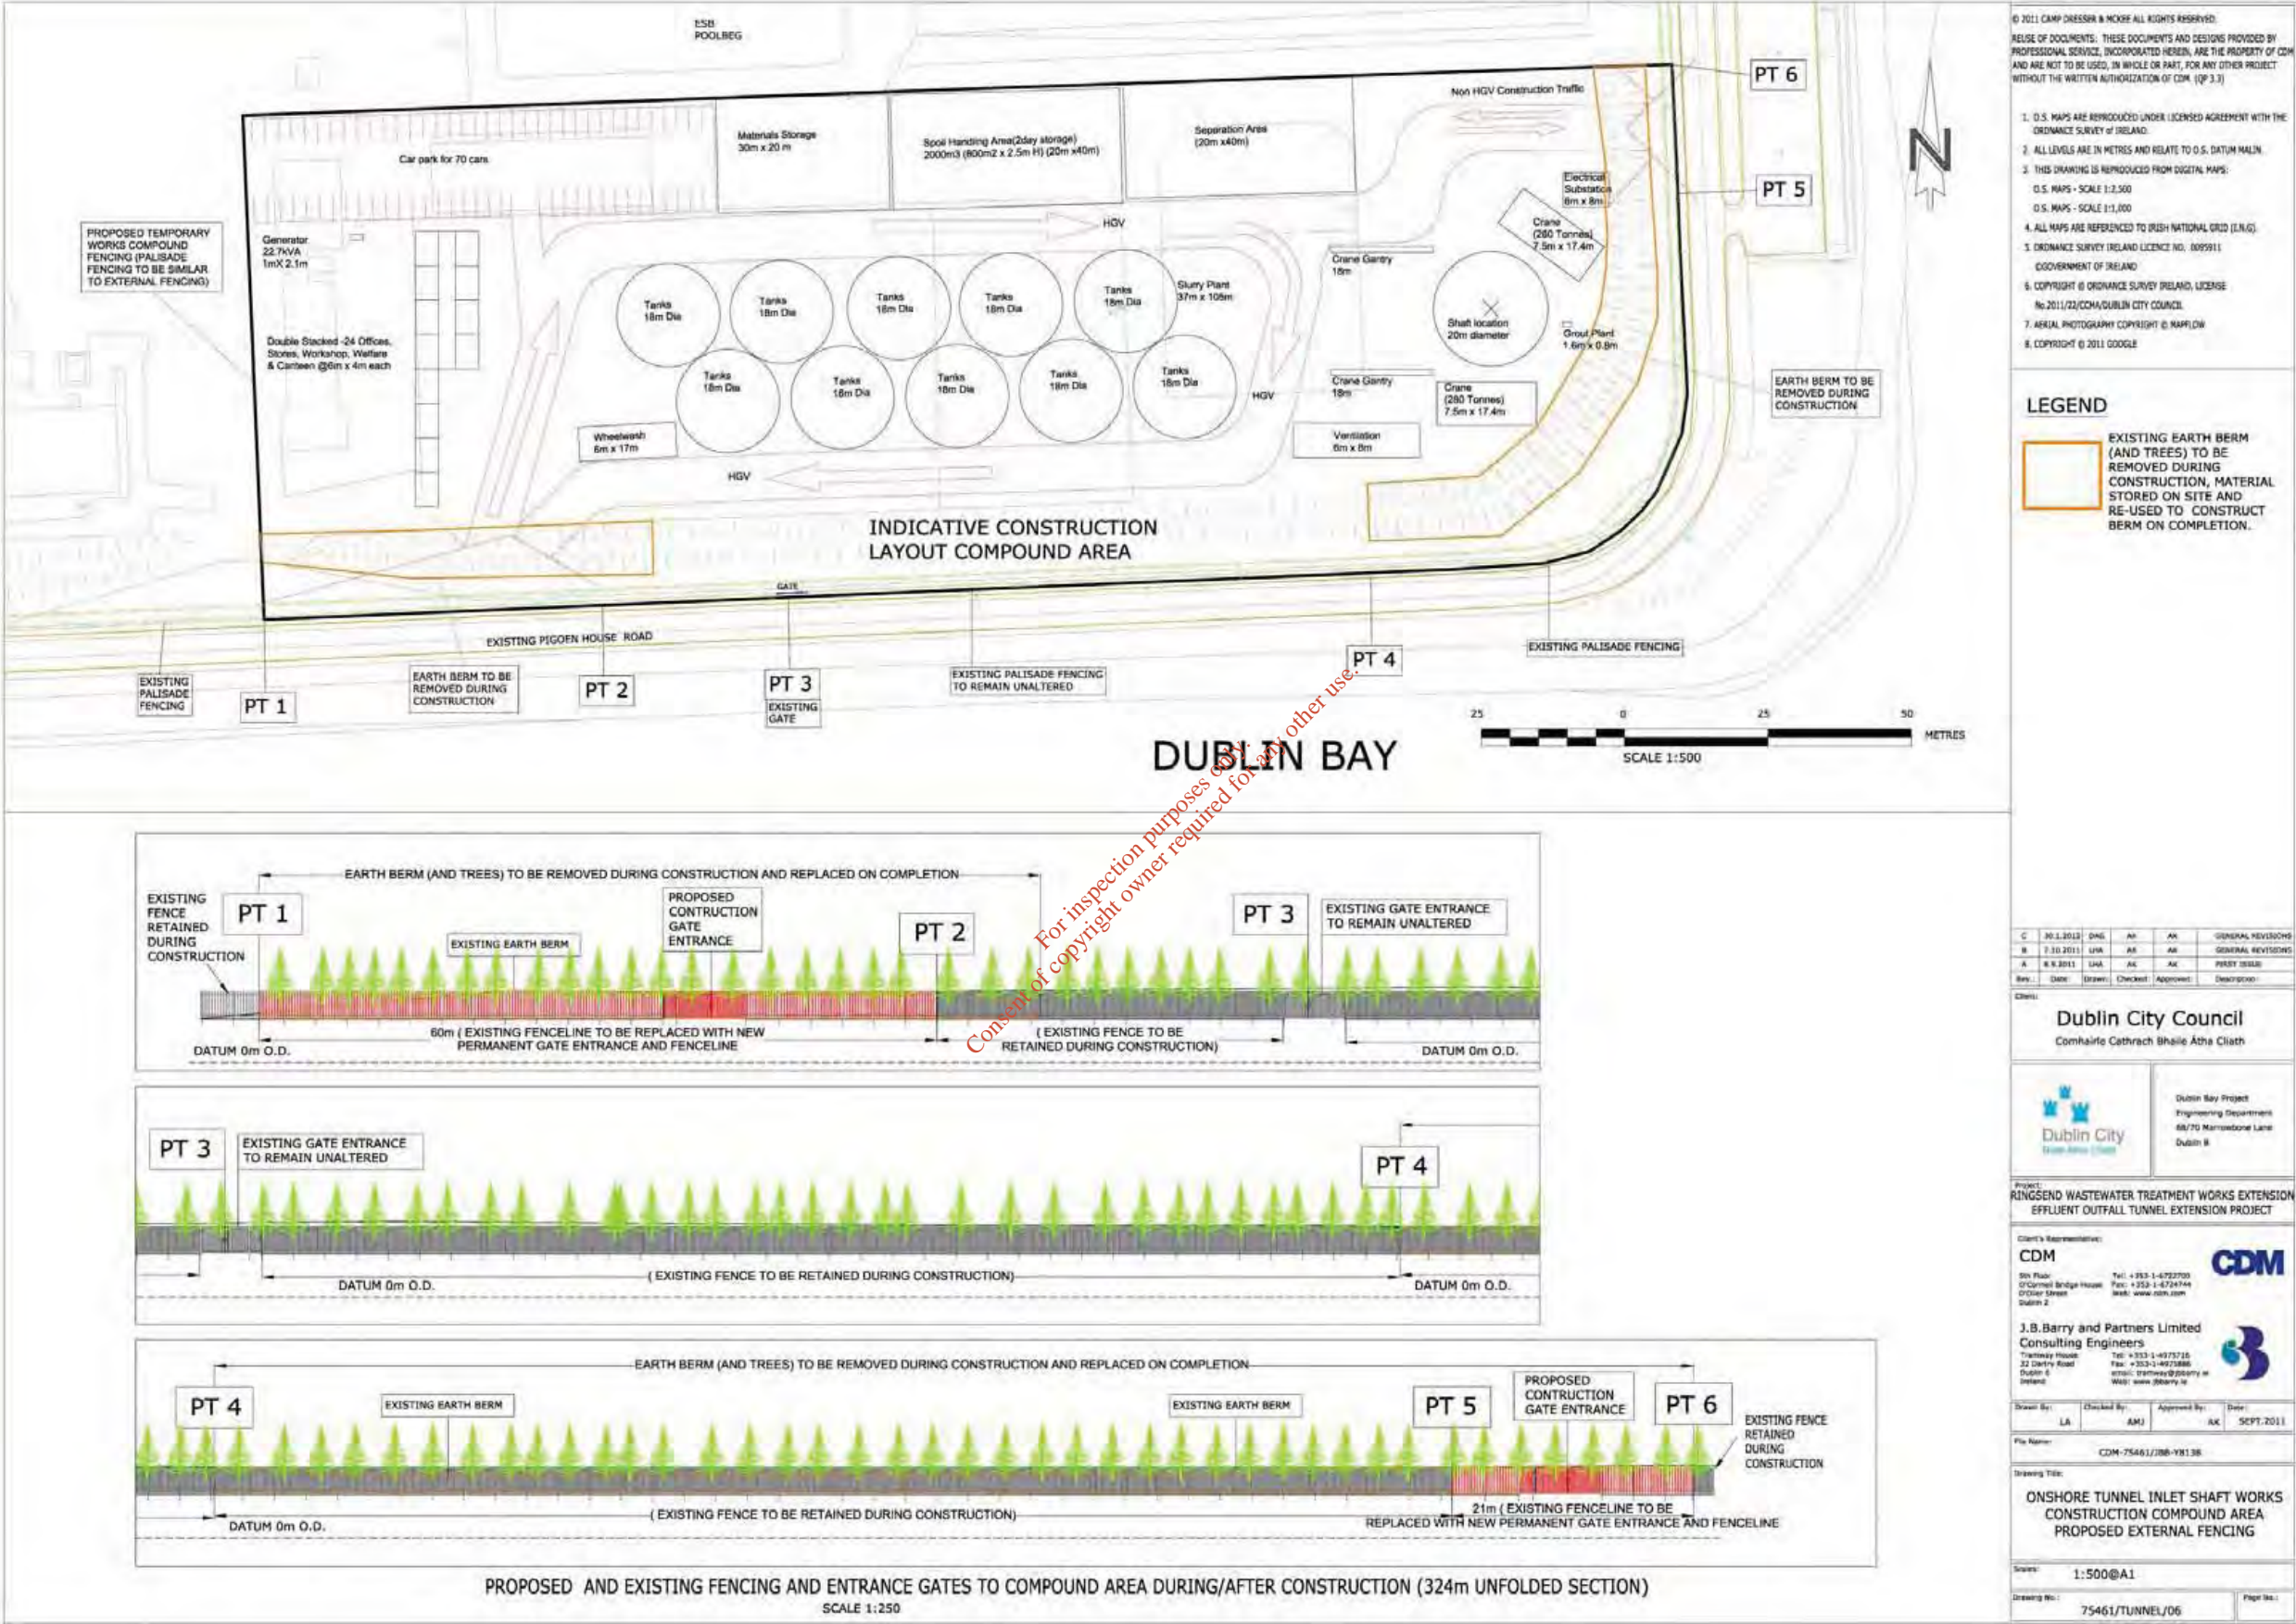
Tunnel Inlet Shaft Compound – Indicative Construction Layout
